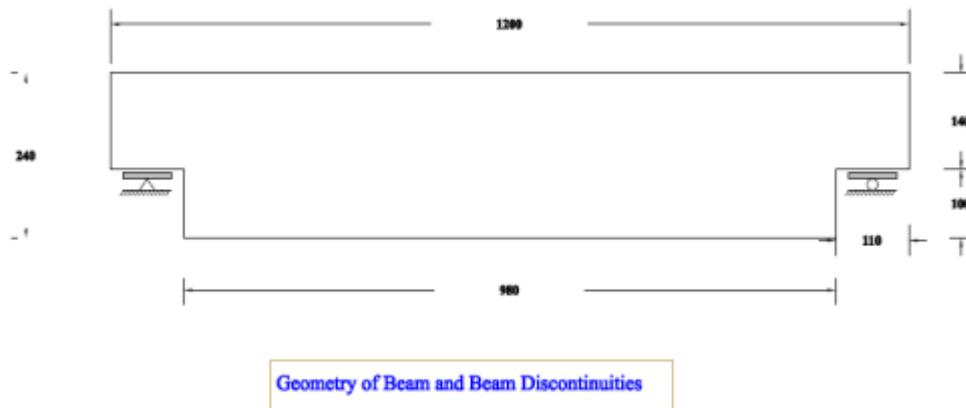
R.C. Beam Dapped Ends Layout & Dimensions (mm).
